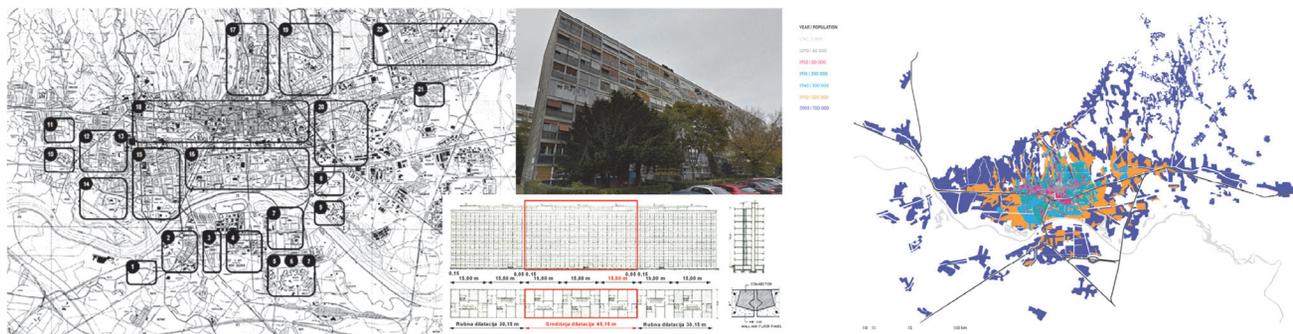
a) Areas with characteristic building types in the city of Zagreb, with a typical building [8]; b) Zagreb expansion diagram [39]
